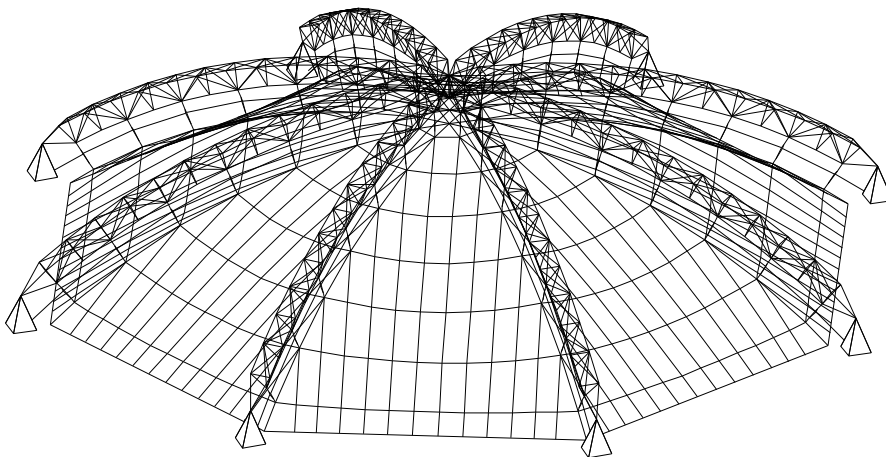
Axonometric view of model 4, cable net supported by four truss arches
